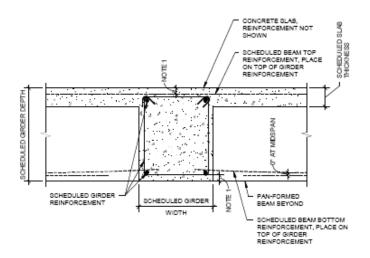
| Typical Floor Section (Courtesy of Walter P. Moore)
